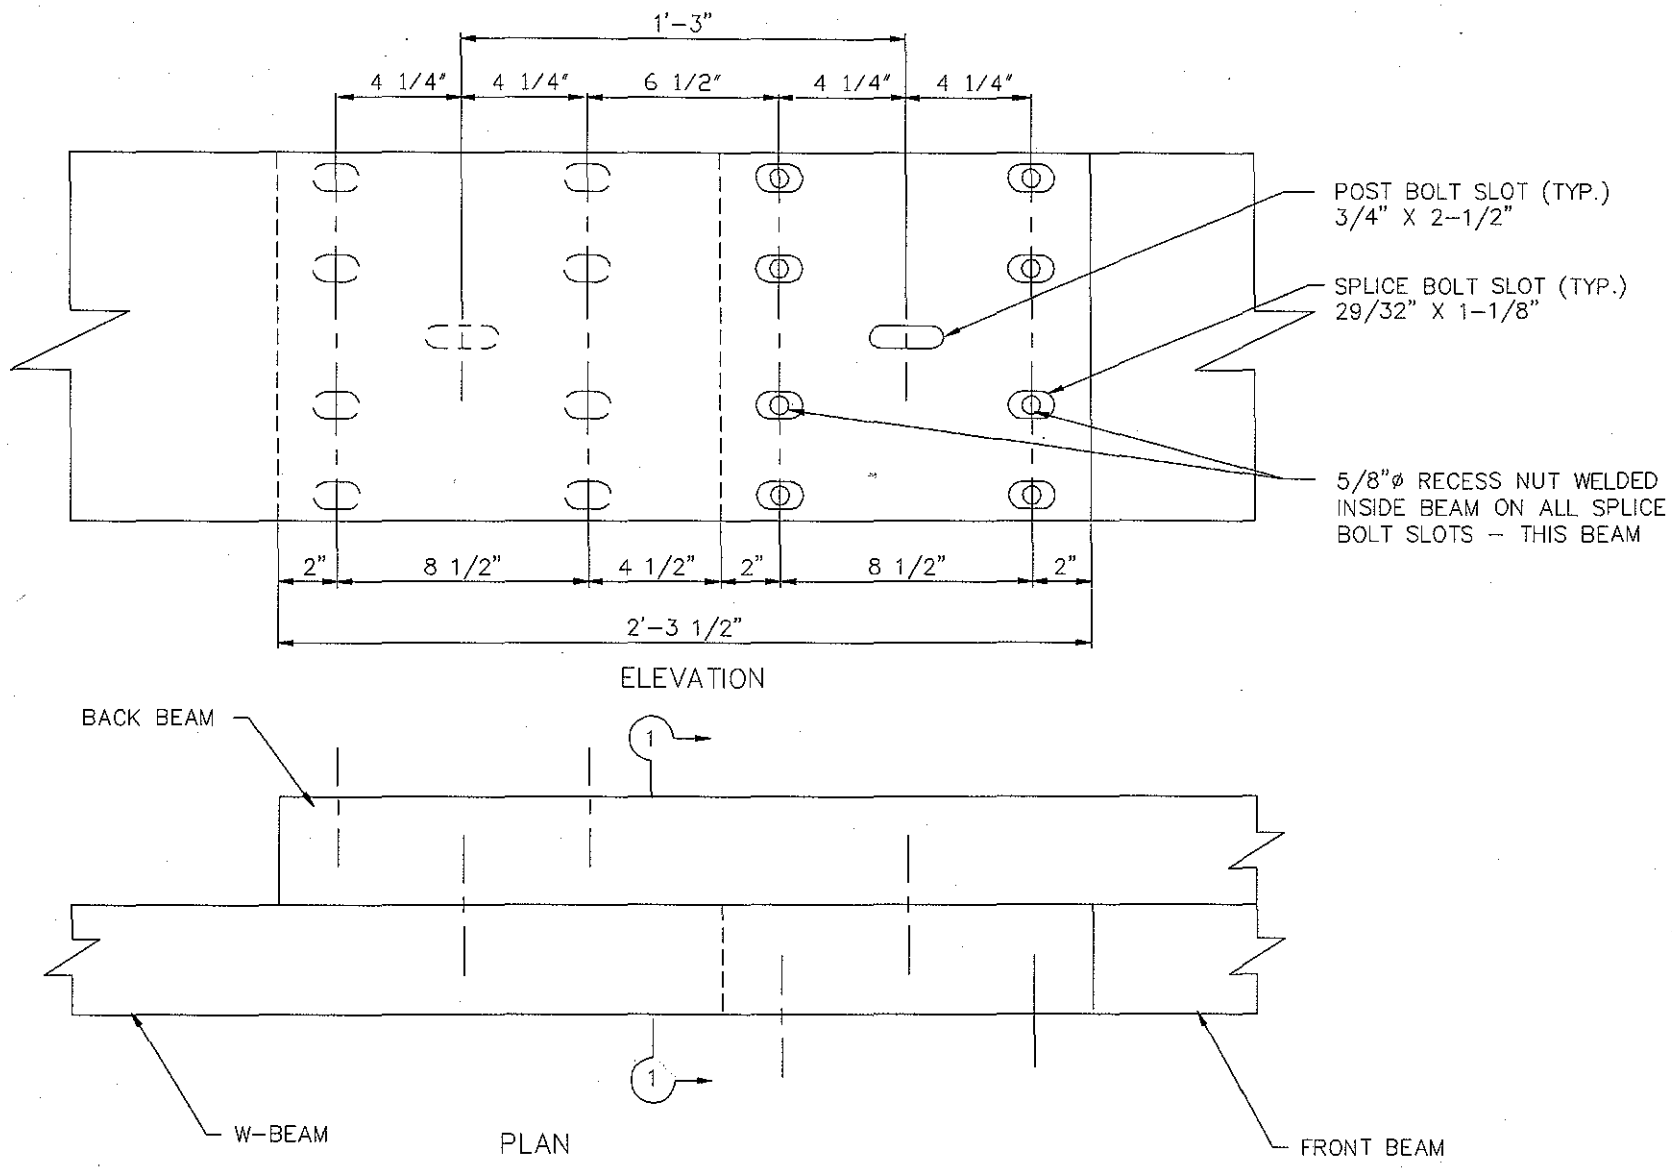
TUBULAR W-BEAM CONNECTION TO SAFETY SHAPE FOR NEW CONSTRUCTION INSTALLATIONS
